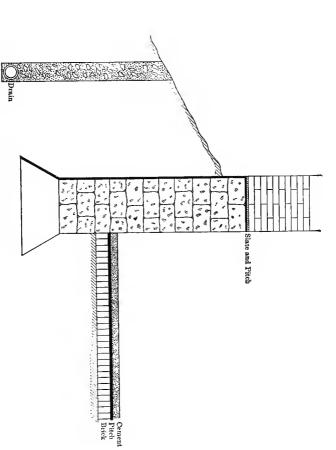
Proper Method of Constructing Foundation. (After Waring.)
